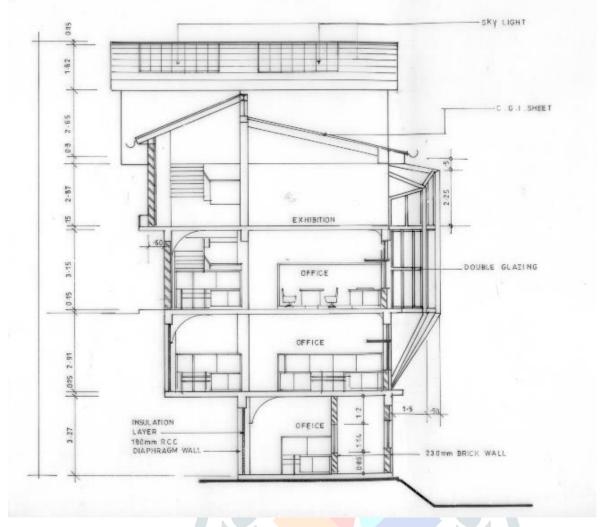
Section of HIMURJA Office building, Kasumpti, Shimla
